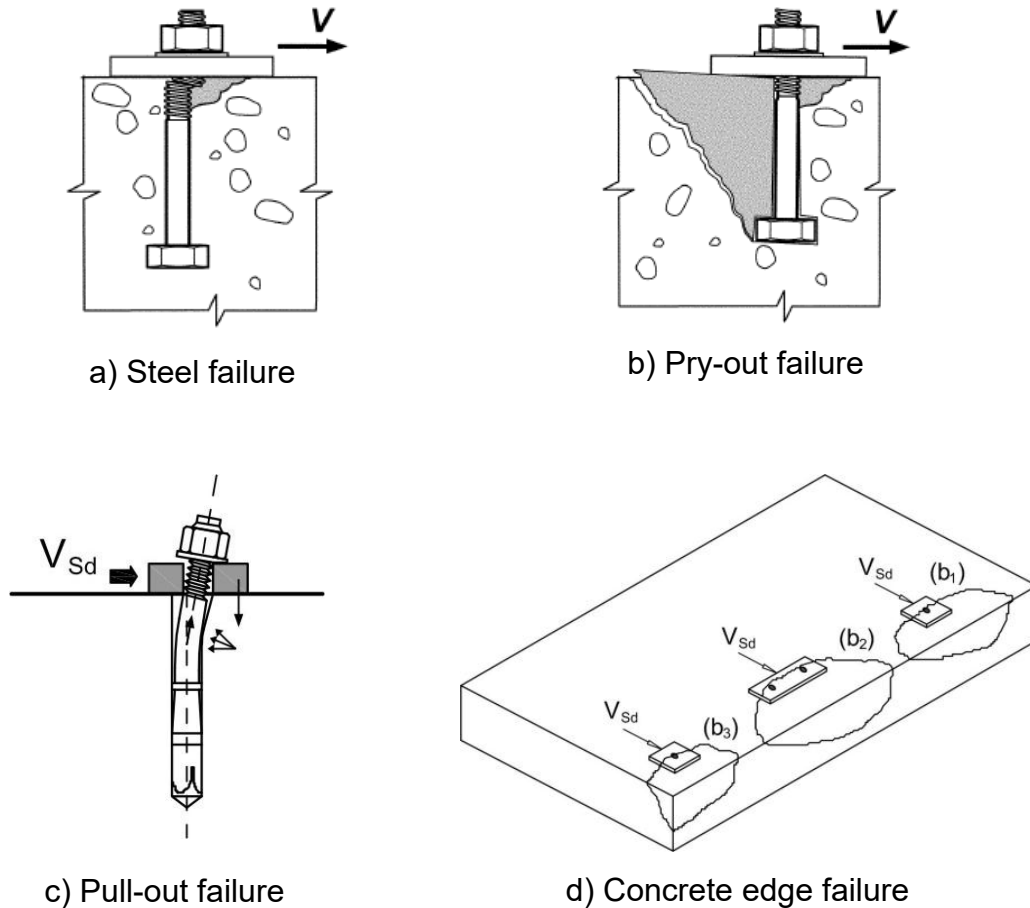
Failure modes of anchors under shear load (from [58] and [72]).
